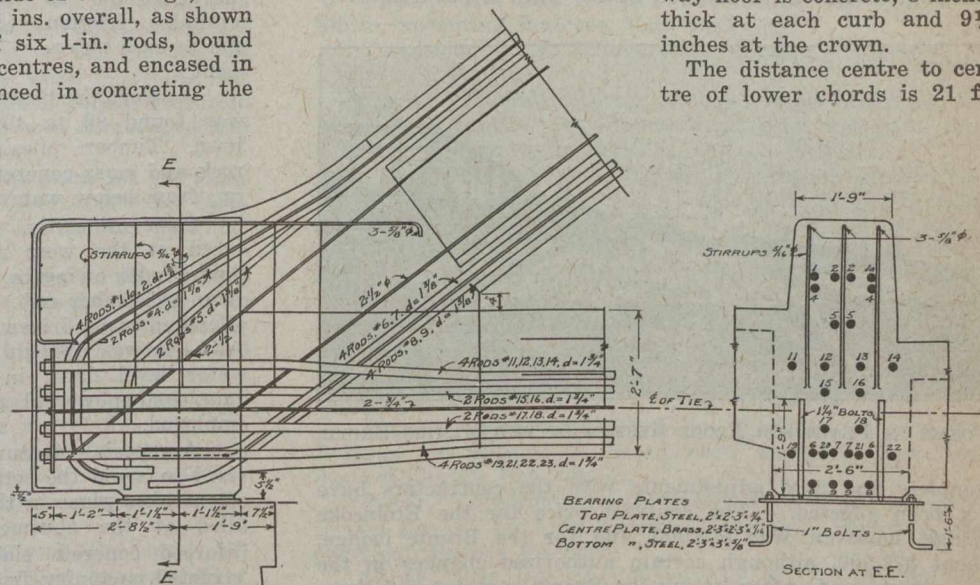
SECTIONS THROUGH JUNCTION OF TOP AND BOTTOM CHORDS, BRONTE BRIDGE, SHOWING REINFORCING AND METHOD OF ANCHORAGE
